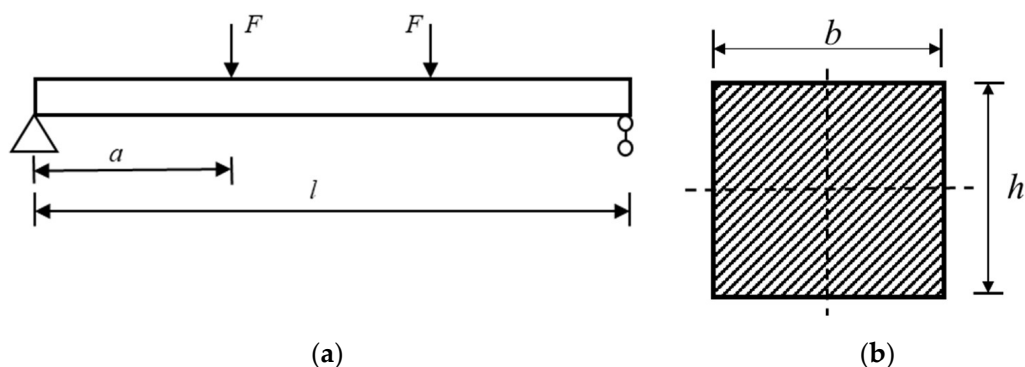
Loading and cross-section schematics. (a) Loading diagram. (b) Loaded beam section.
